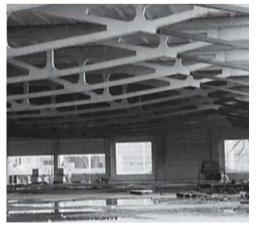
Trussed beams Factory building, Lustenau (A) and hence weight and the beam constructed as a girder or trussed beam (trussing above or below).
